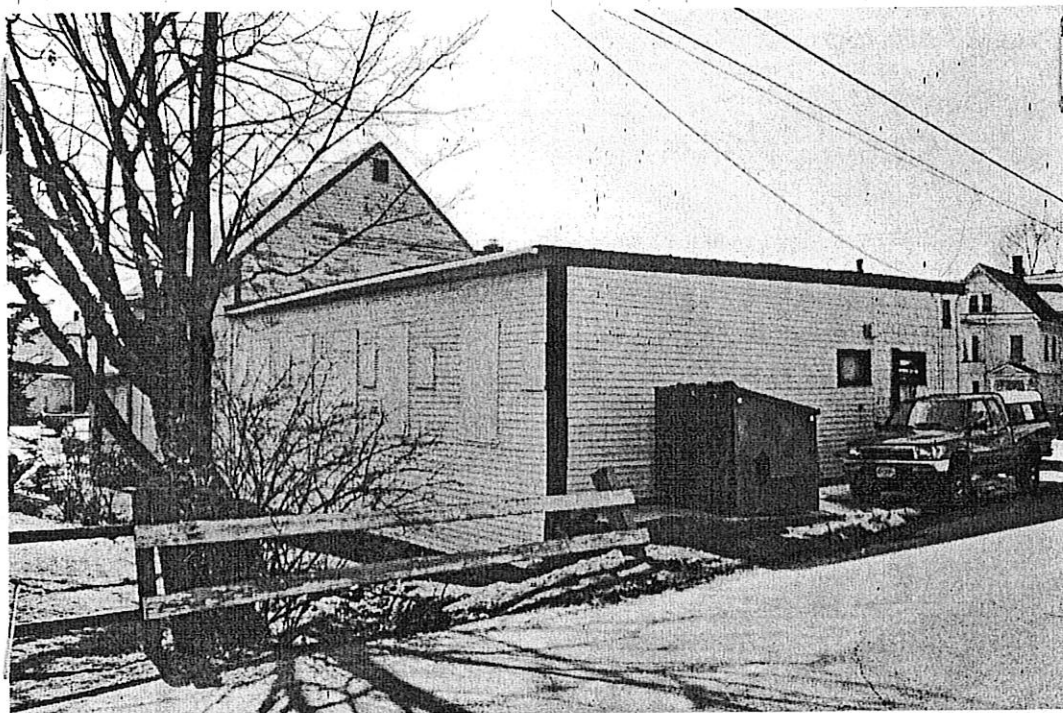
description: North & rear walls of auto garage addition, showing N. wall of barn in background
